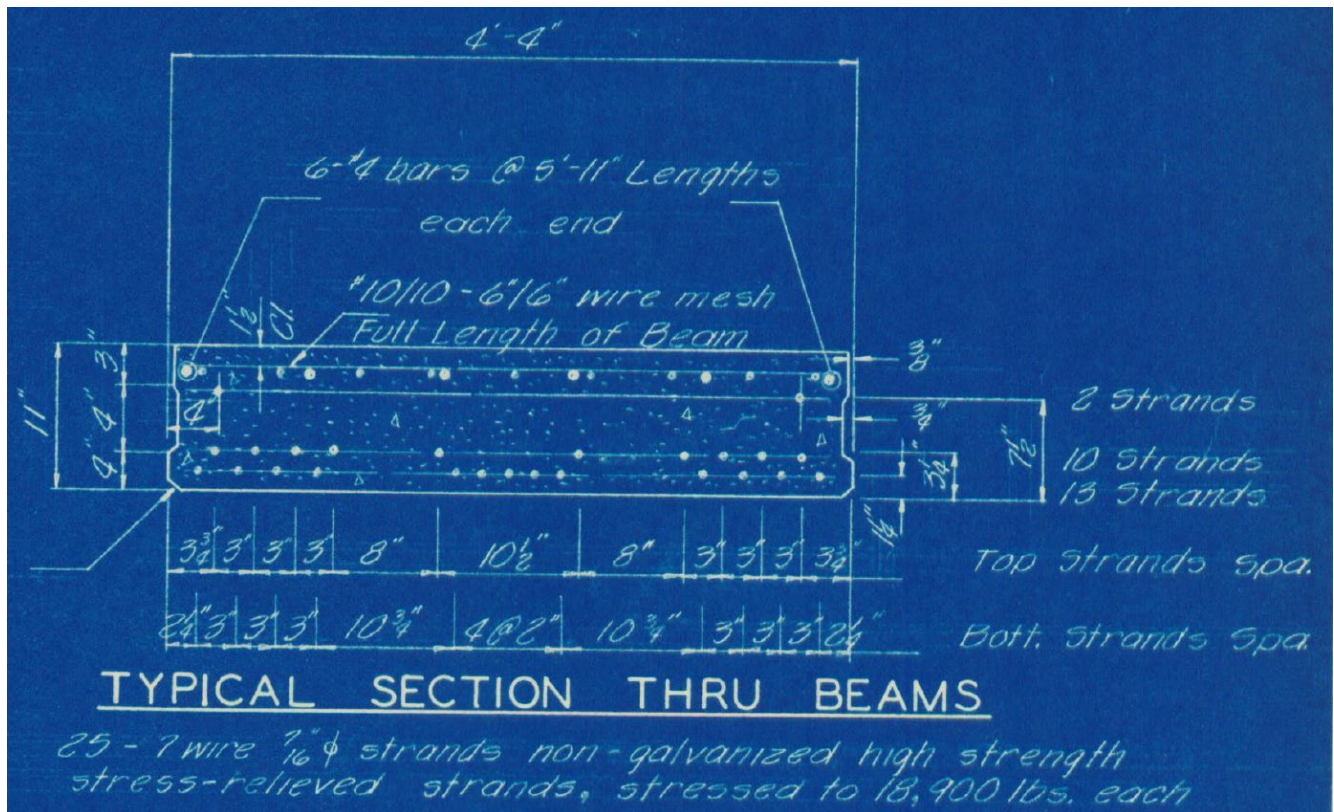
Photo. Cross-section of PPC deck beam per original design drawings.
